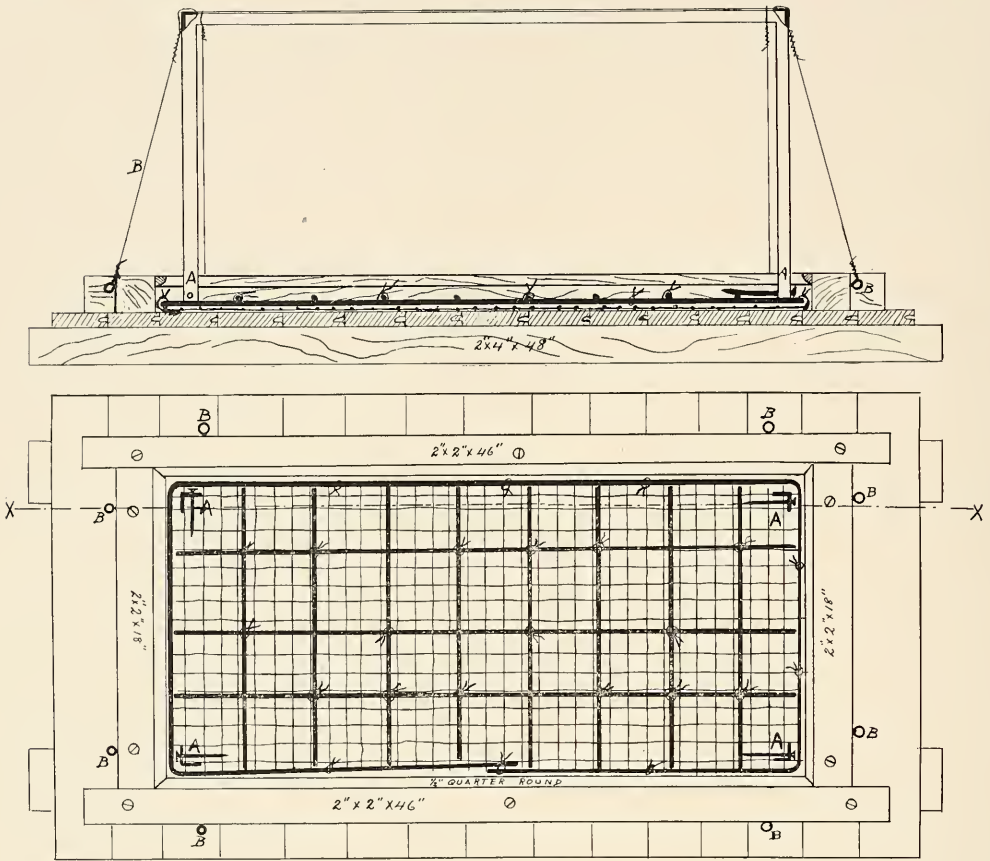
Above, Cross Section of Mould or Form for Cement Base at X—X, with Frame Stayed with Wire. Below, Ground Plan of Mould, with Reinforcing in Position.
